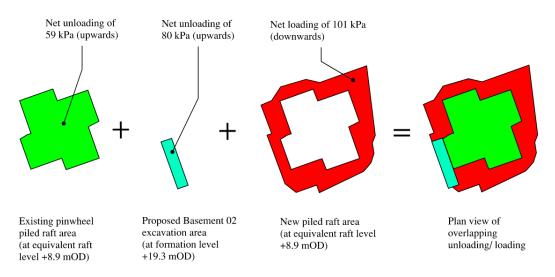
Net unloading/ loading applied in Oasys PDISP model, resulting from partial superstructure deconstruction, proposed Basement 02 excavation and new superstructure loading.
